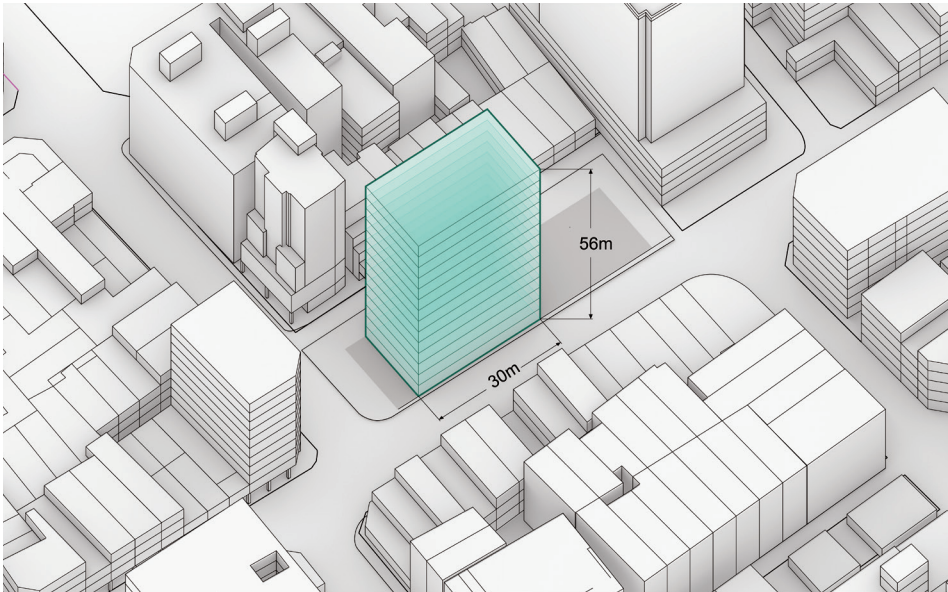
A mid-rise option of 14 storeys can be built if half of the buildable site is used.
